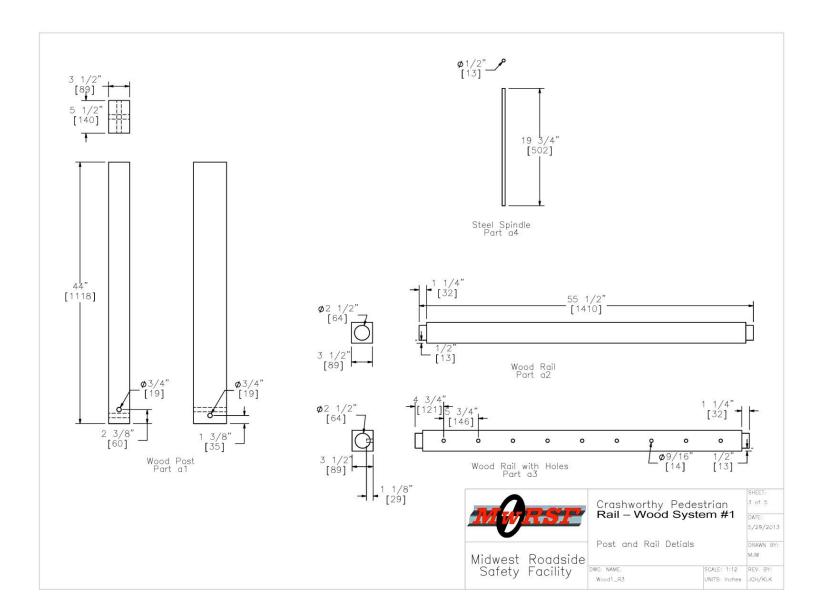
Modular Wood Rail, Design Concept WOOD1 (Sheet 3 of 5)
